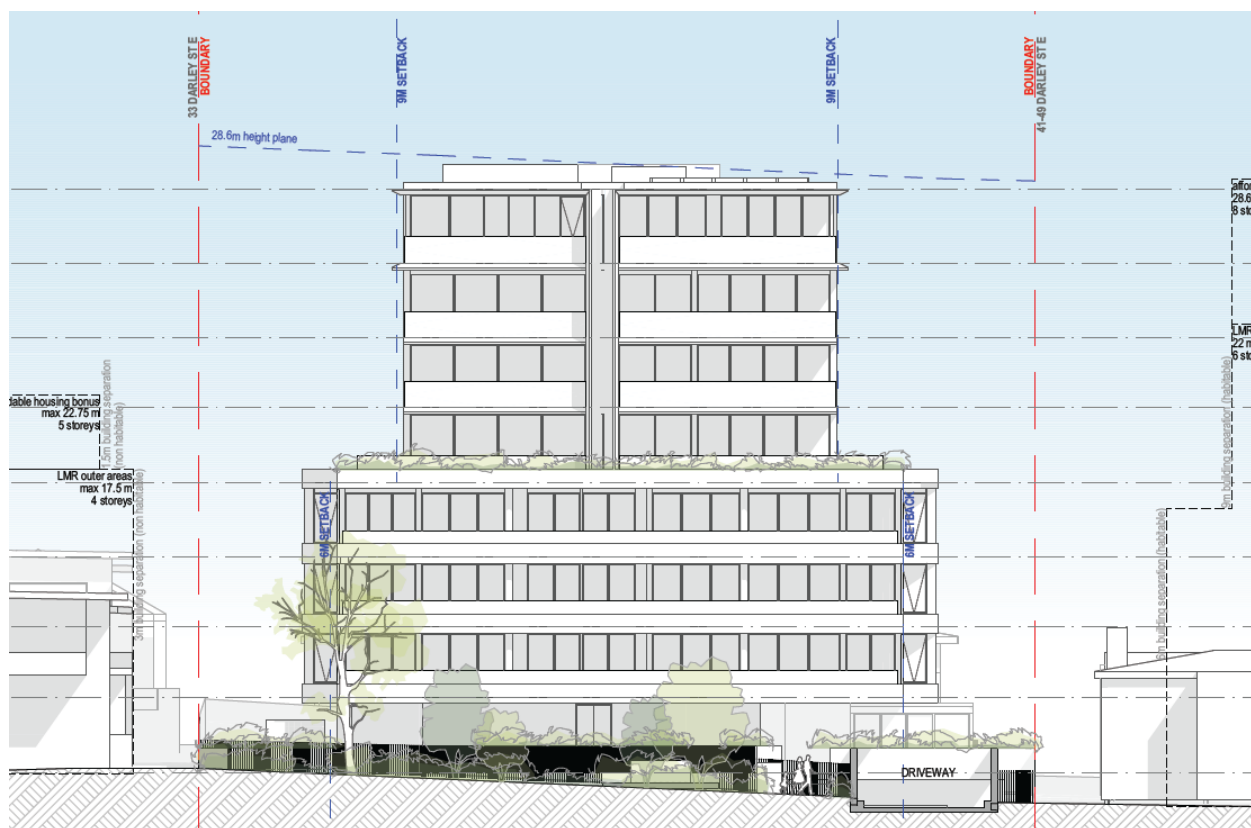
Eastern elevation, Darley Street East (Source: Plus Studio)
